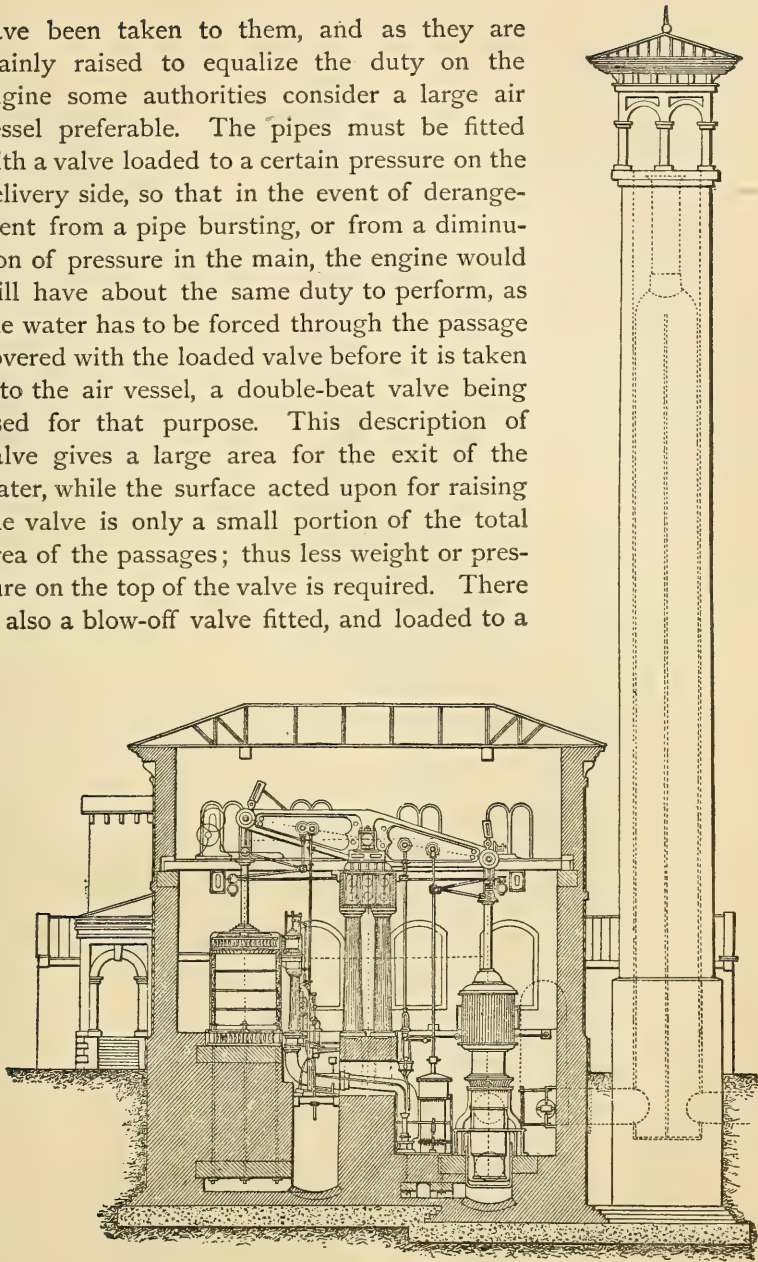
Single-acting Pumping Engine with Stand-pipe Tower.
